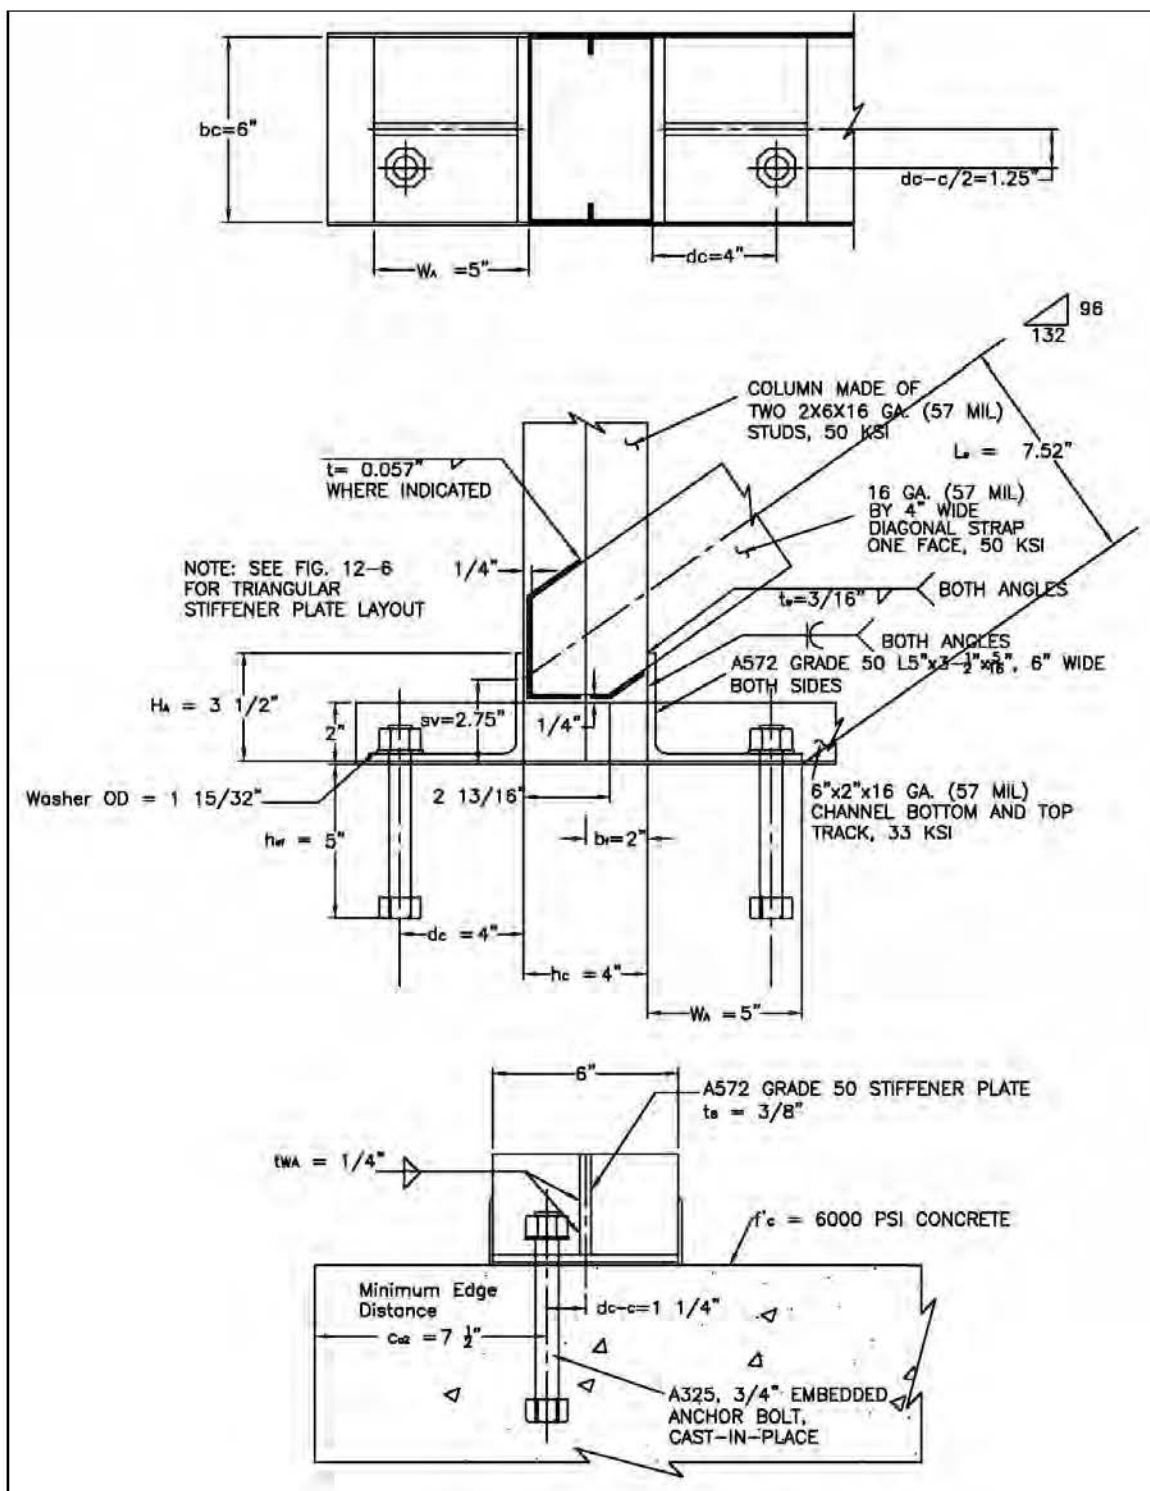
Example connection/anchorage detail – 5th row of Table 12-6 and Table 12-9 through 12-22.
